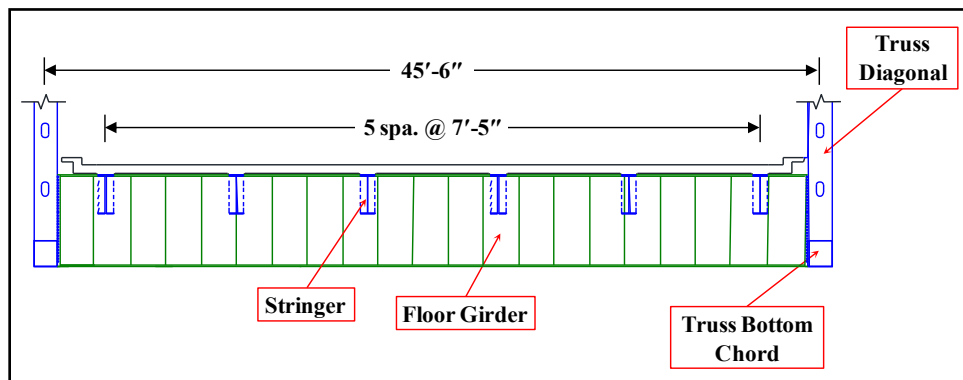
Typical deck cross section of the original truss bridge built in 1917
